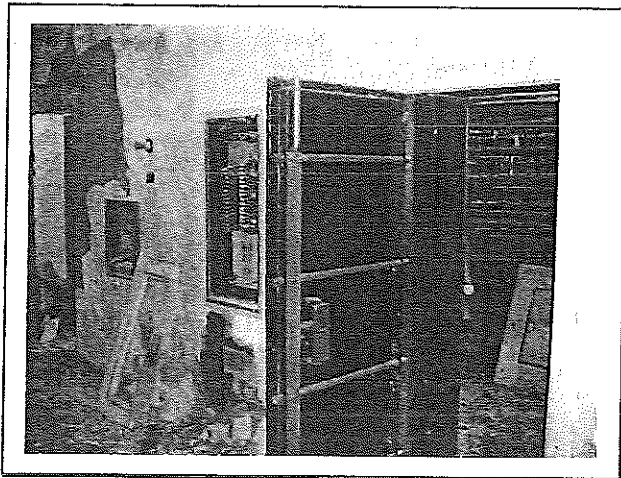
Viewing black vault door, 1st and 2nd floor.
